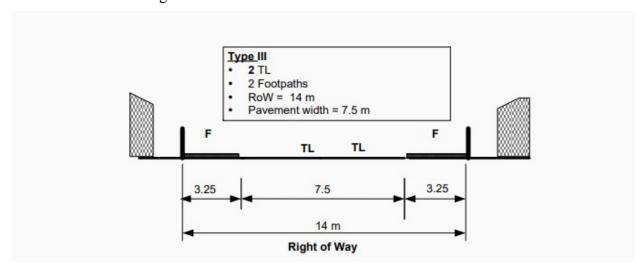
3 Typical Cross-section for Class A Roads (with RoW 14 m)
